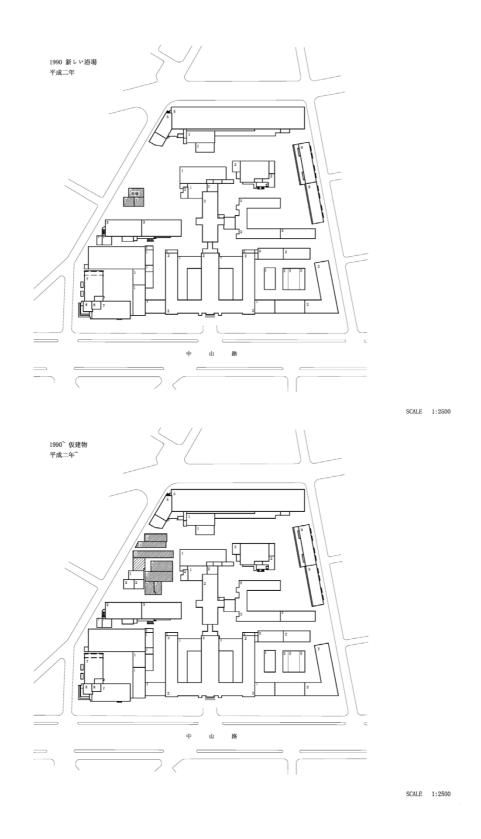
Retraced Campus Site plans of Nanyuan Campus after 1945
